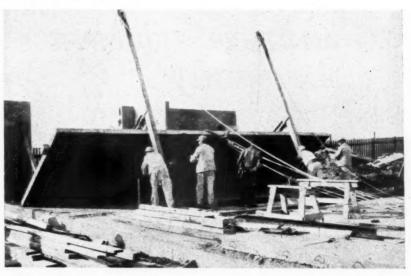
Tilting up a wall slab east flat on a floor slab, by means of hydraulic jacks.
